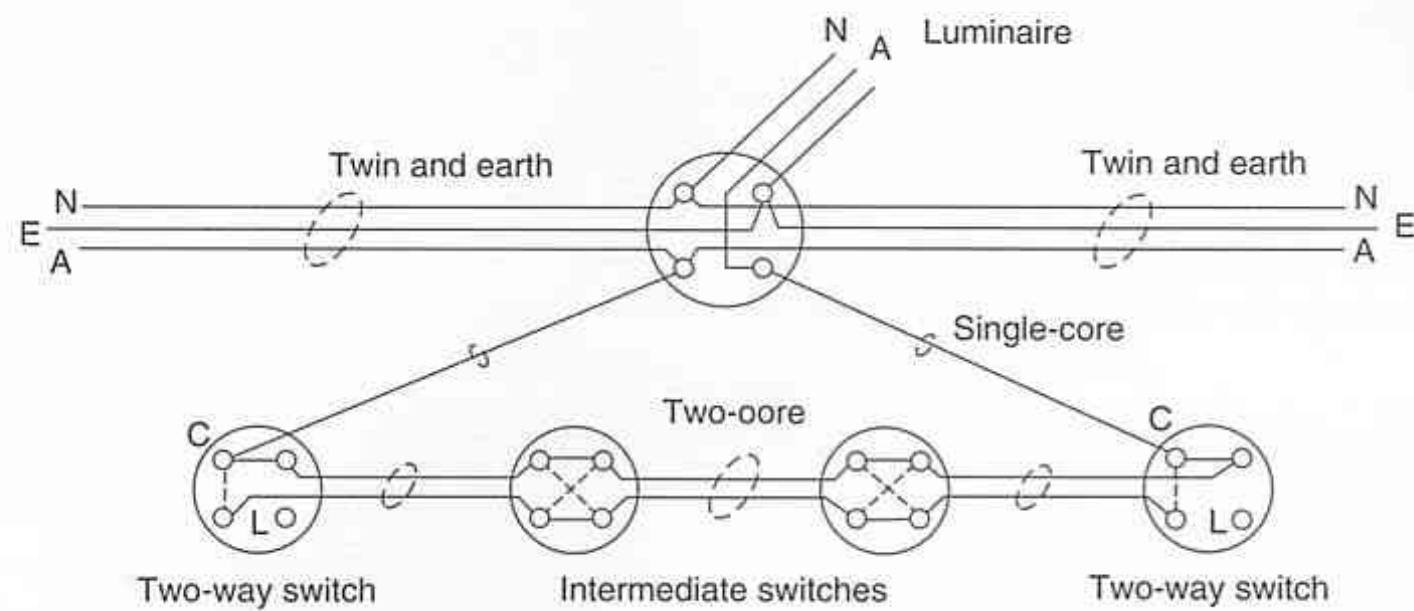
Multiposition control of a luminaire, using single-core, two-core, and twin and earth cable. Connection of 'strap wires' to intermediate switches depends on the internal bridging positions of switches used
